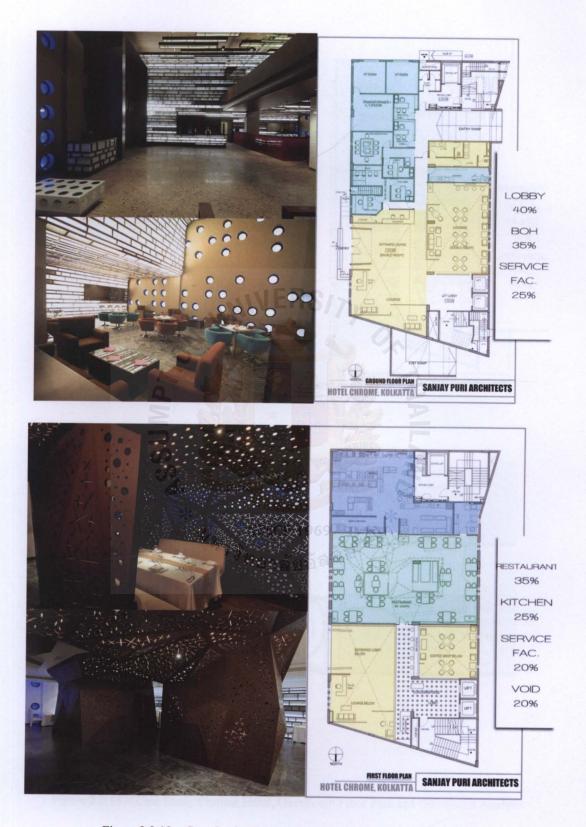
Case Study Chrome Hotel, Ground and First Floor Plan
